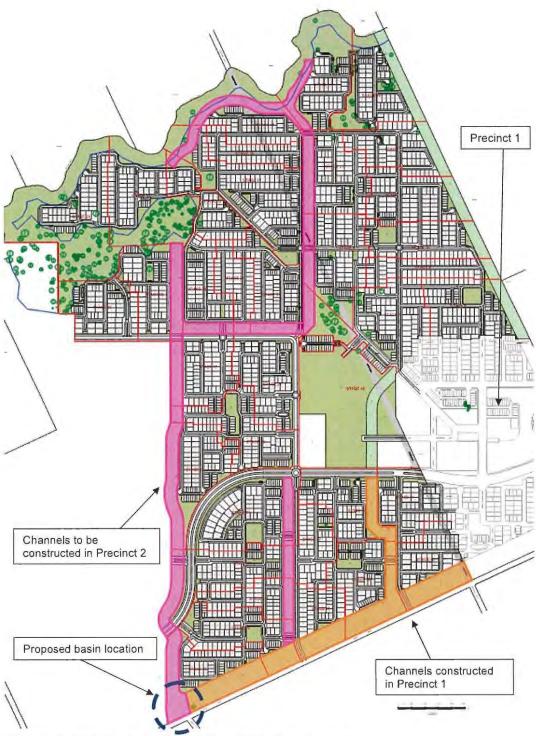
Precinct 2 Locality Plan and Proposed Channel Layout
